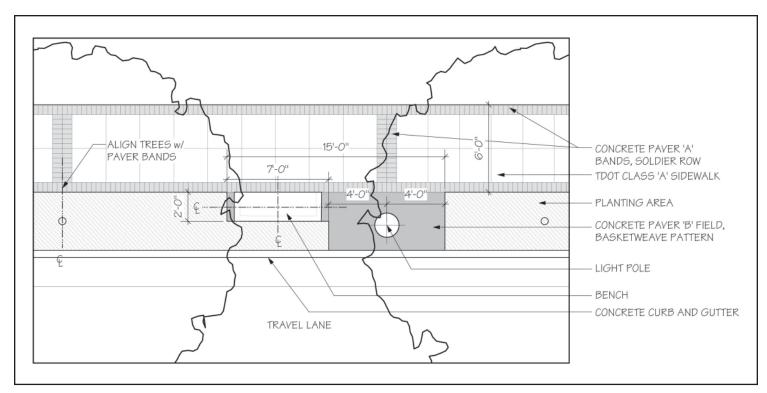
Sidewalk Detail Plan-Bench layout for sidewalk adjacent to travel lane.
